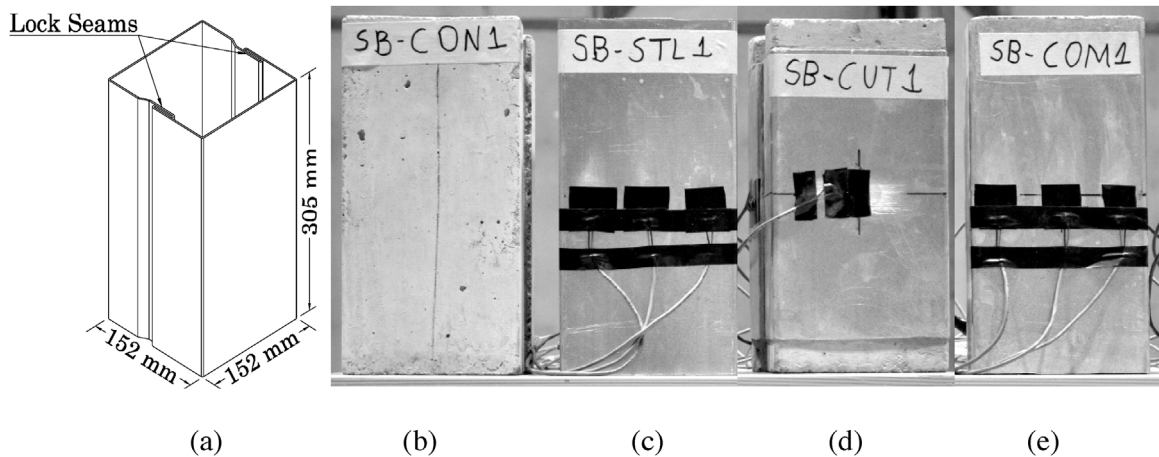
Stub columns: (a) steel section; (b) concrete-only columns; (c) steel-only columns; (d) composite columns; and (e) confinement columns.
